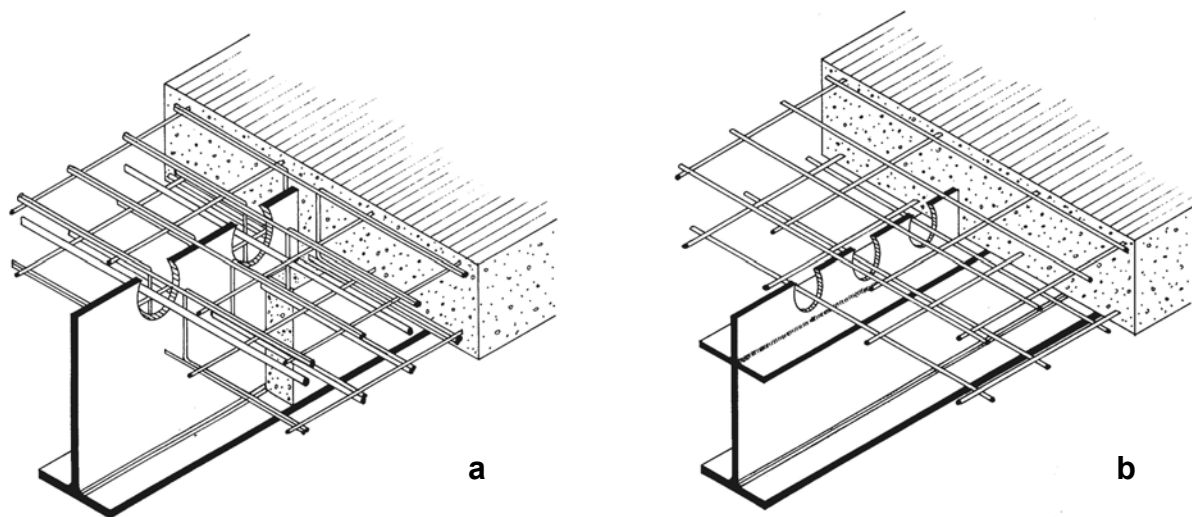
Alternative designs of composite beams with concrete dowels for shear force transmission
